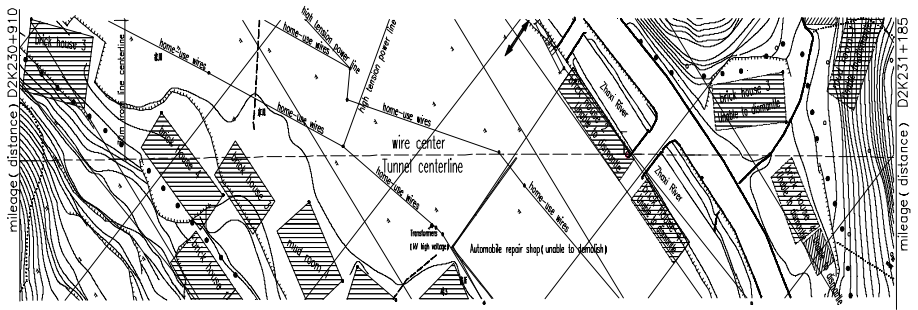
Layout Plan of the shallow-buried section of the tunnel (underneath buildings)
